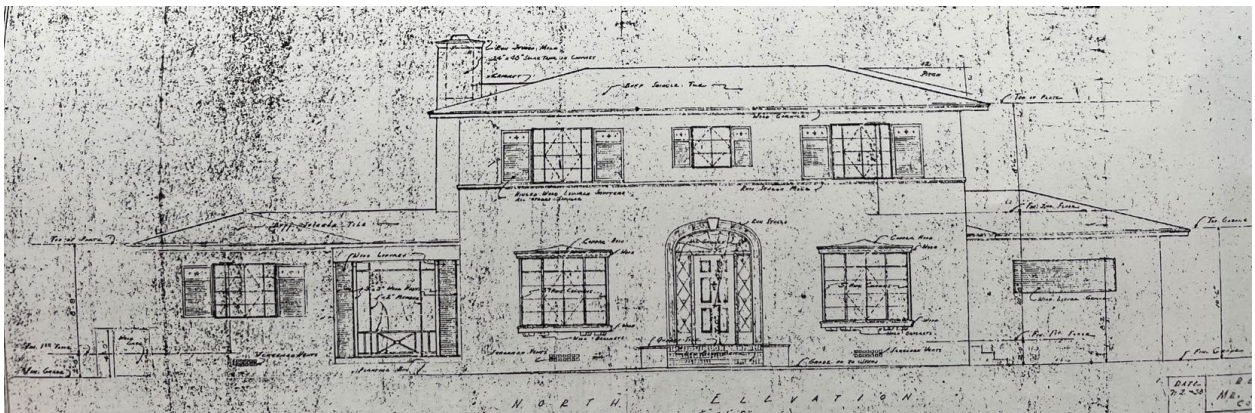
Front Elevation, 1938 Permit Drawings #5701
